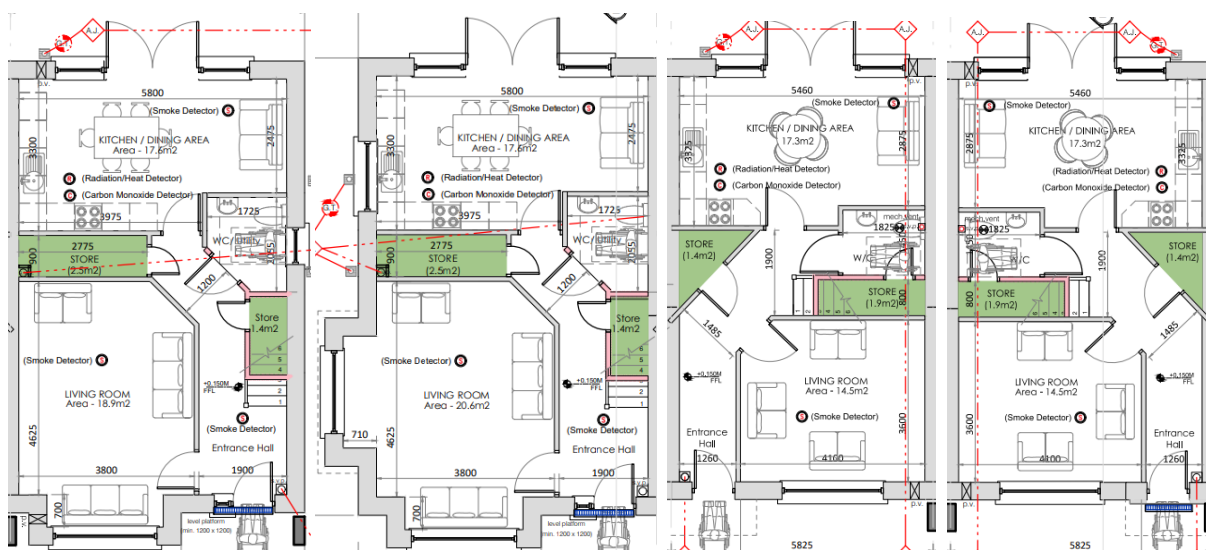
Ground floor plan of House Types E (left), ED (centre left), F (centre right) & FG (right)
